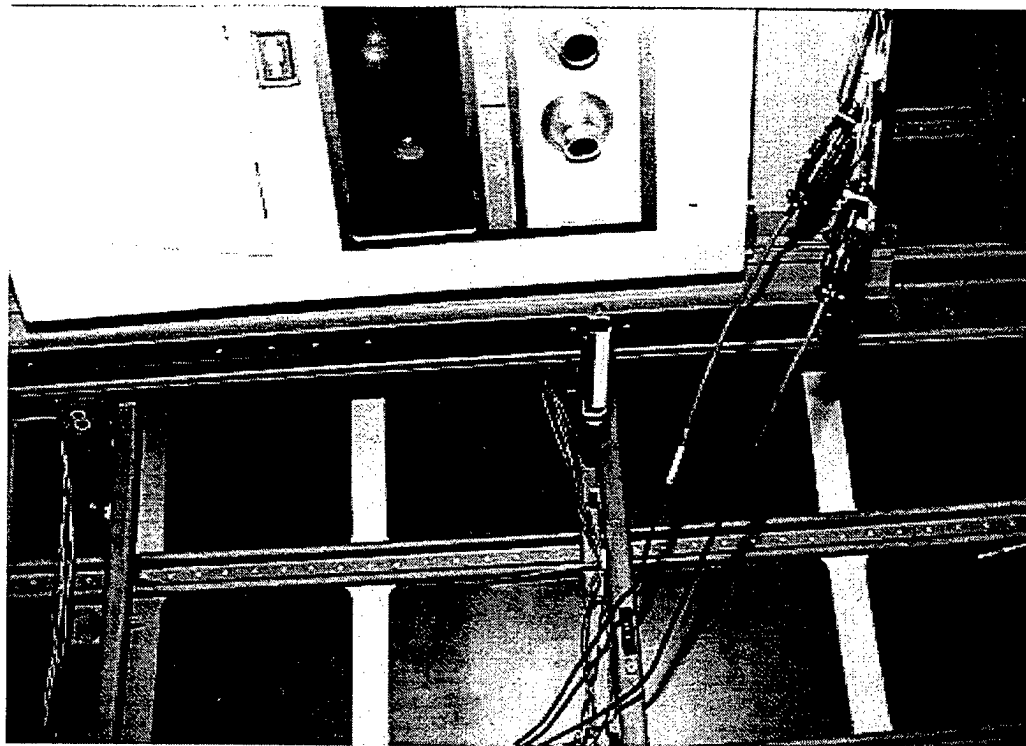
PRETEST BIN B SUPPORTS 7 AND 8 BOTTOM VIEW
